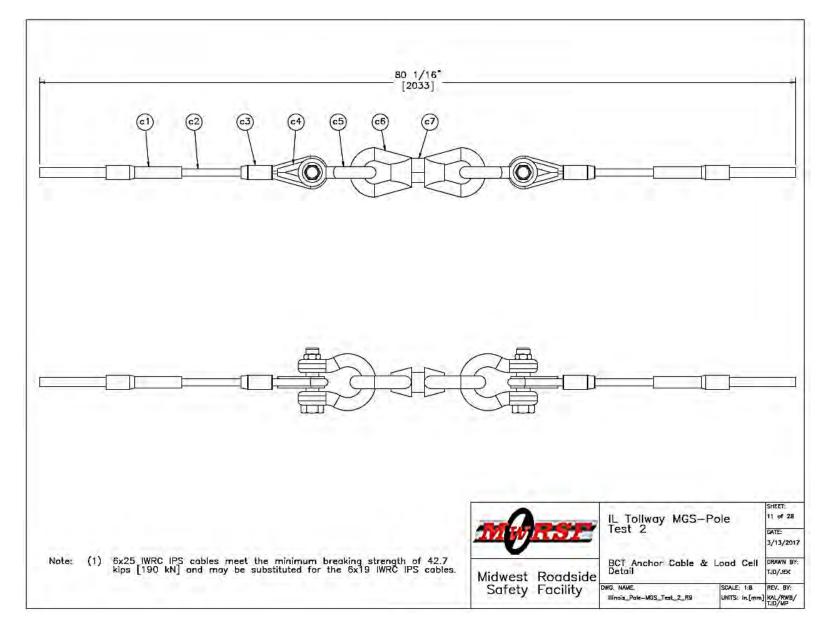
BCT Anchor Cable and Load Cell Detail, Test No. ILT-2
